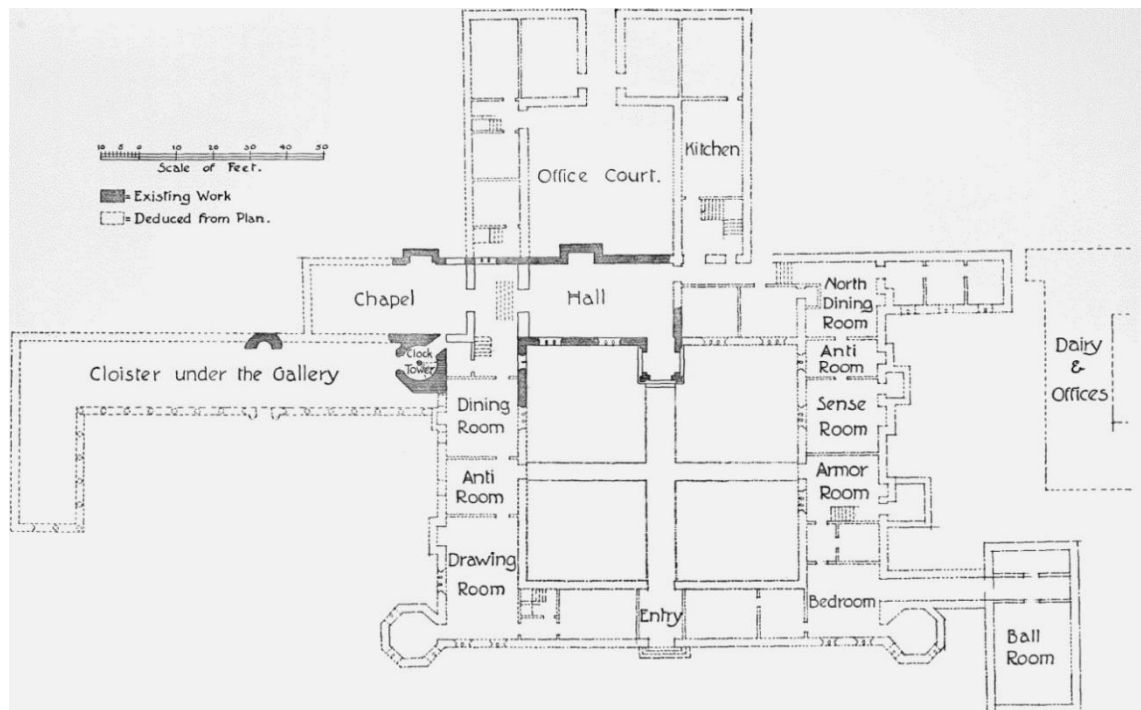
Ground floor plan of Old Gorhambury House (Page, 1821)
